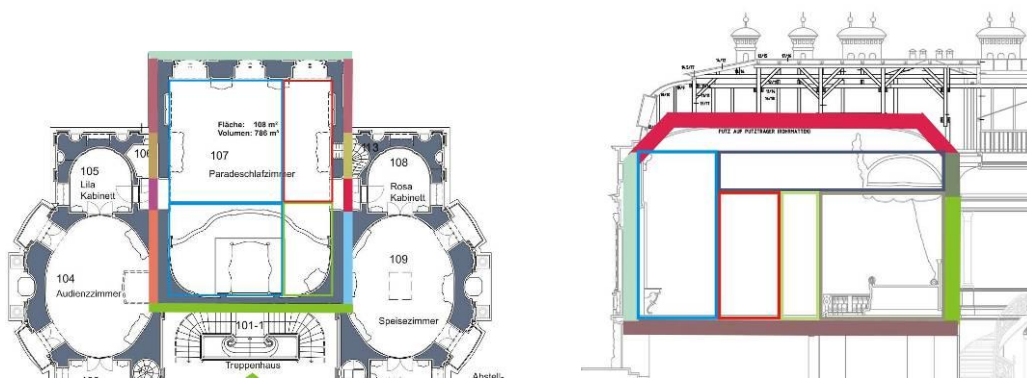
Upper floor plan with a sketch of the simplified room model of the King's Bedchamber with different wall partitions and their referred climate. The rectangle areas show rooms below in the ground floor with their arrangement in the building simulation. The right picture shows the model in cross-section lengthwise with referred building assembly and adjacent climate zones. (BSV)
